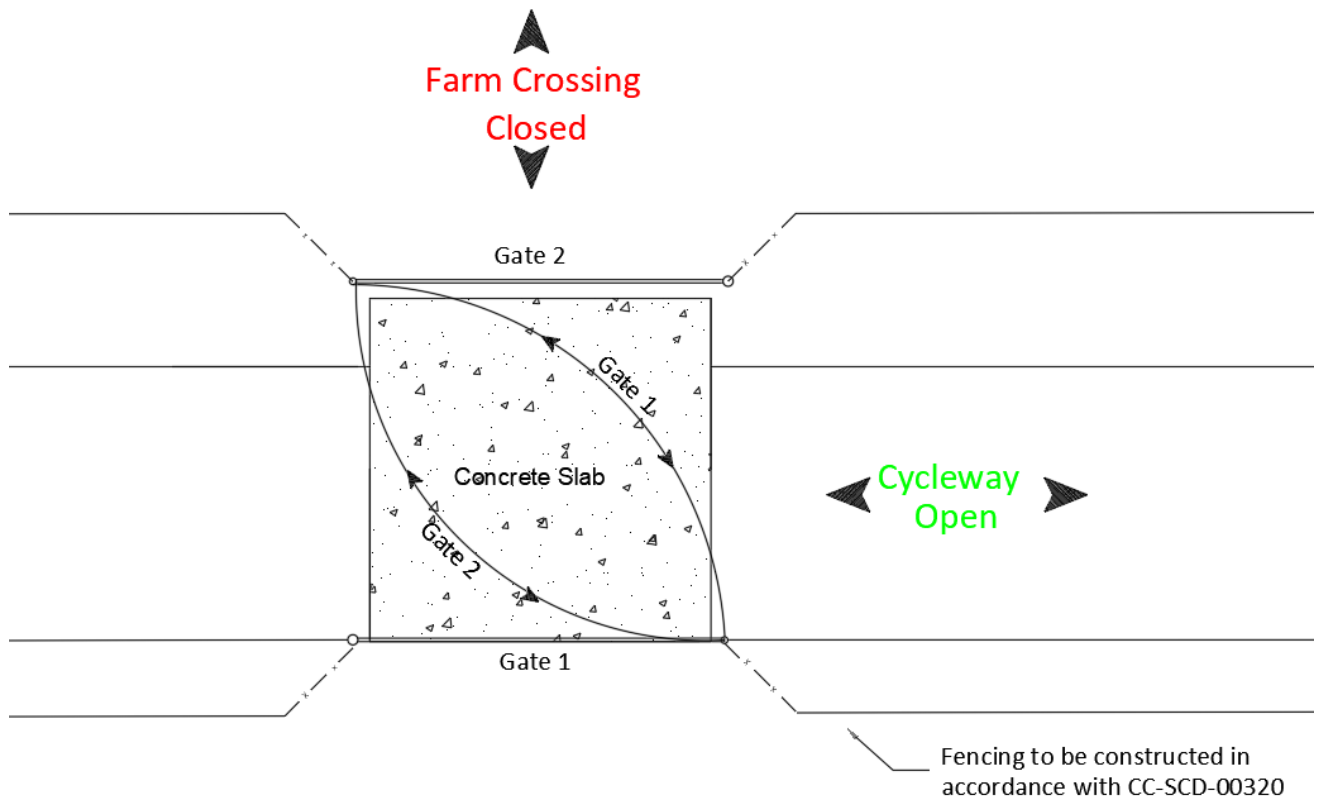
Farm Crossing Gate Detail (Open for Greenway Users)
